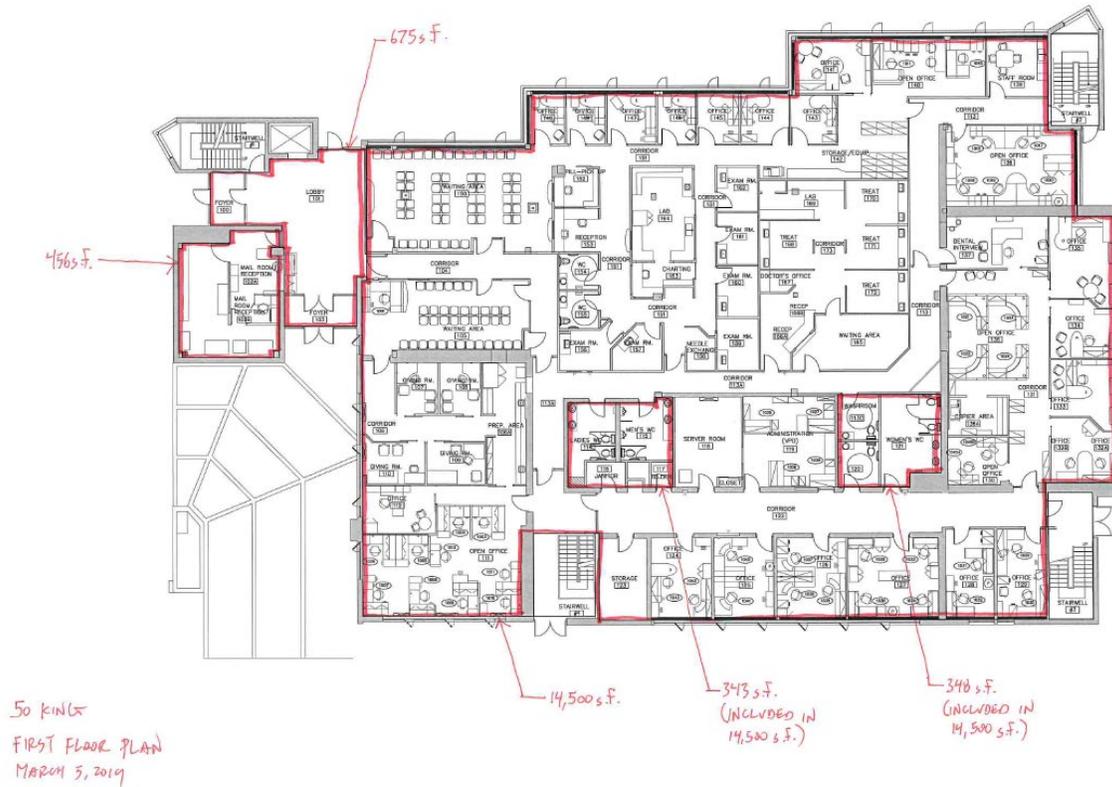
View of existing first floor of 50 King Street, London (Courtesy of York Developments March 2019).
